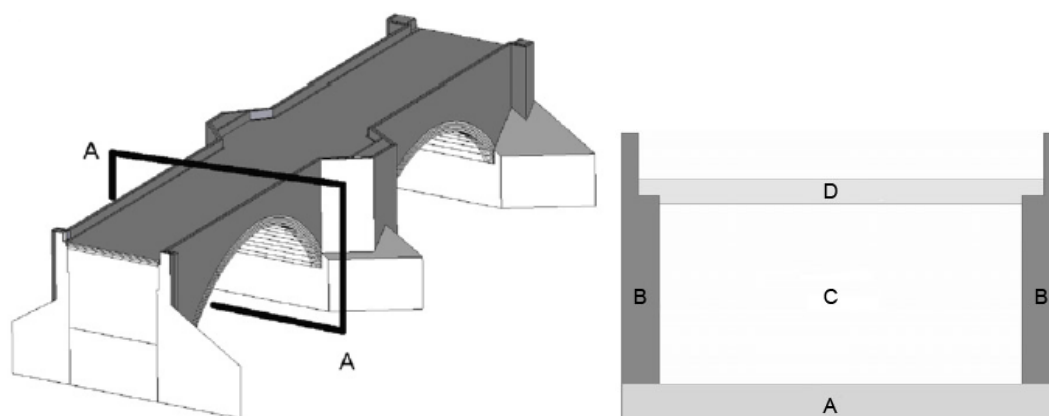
Schematic 3D view of Charles bridge with A-A section.
